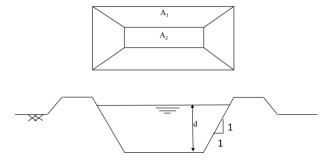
Plan and elevation of rectangular/ square size water harvesting pond
